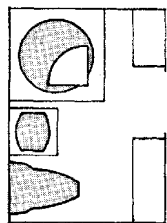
Japanese soaking tub—new here, but old in Japan—allows a full 12-inch-deep wall system.
